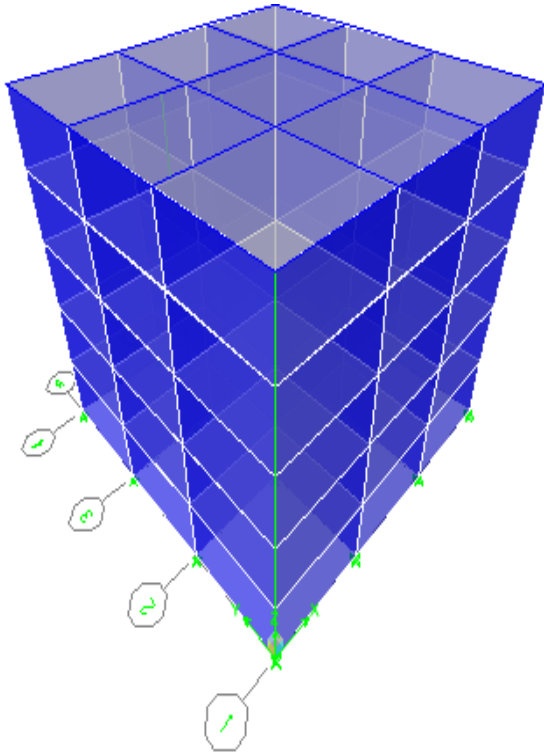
3D Model of G+5 Storeyed Building with Walls
